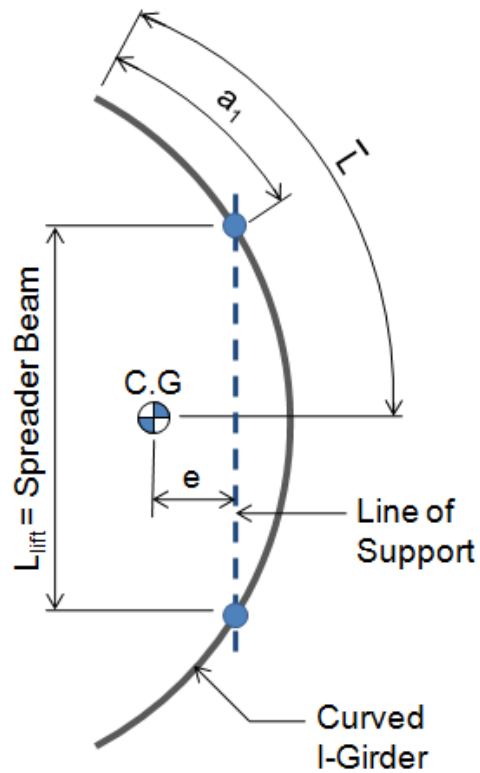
Plan View – Center of Gravity, Non-Prismatic Girder
